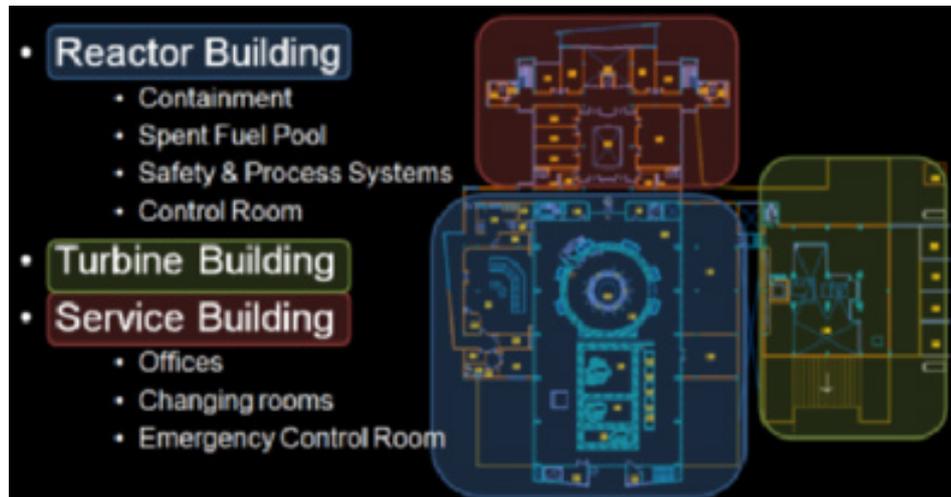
CAREM-25 plant layout (Reproduced courtesy of CNEA)
